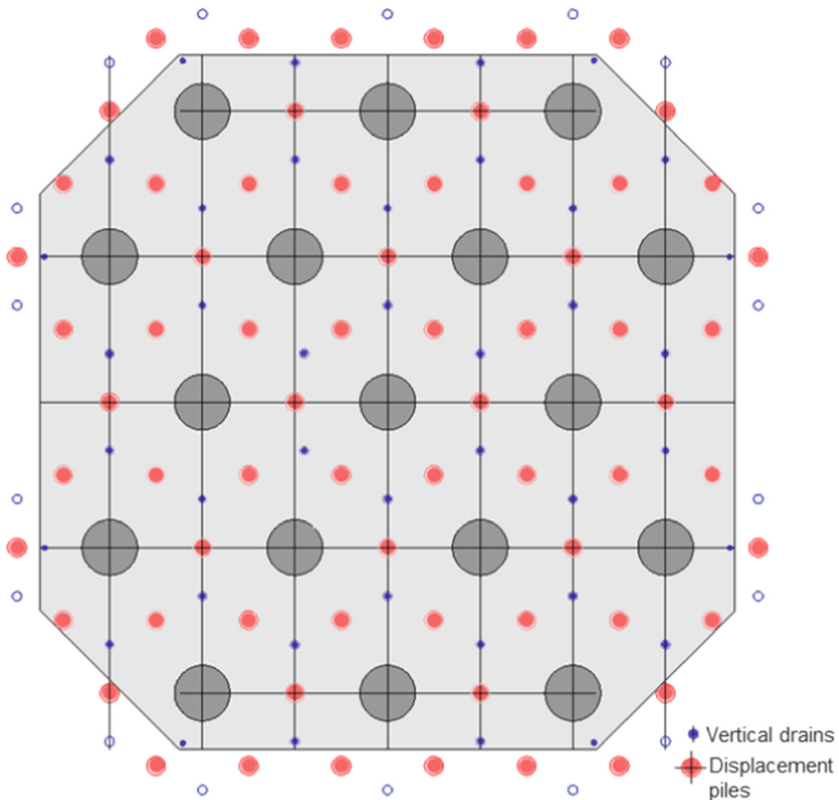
Plan view of the foundation and layout of bored piles, displacement piles and vertical drains for the second alternative.
